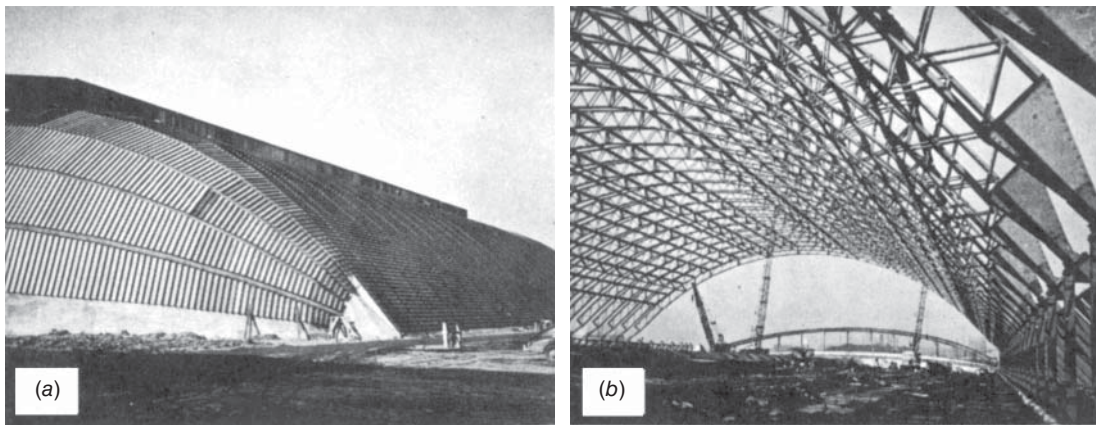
Hangar-type arch structures using cold-formed steel sections. Courtesy of Armco Steel Corporation.^{1.6}
